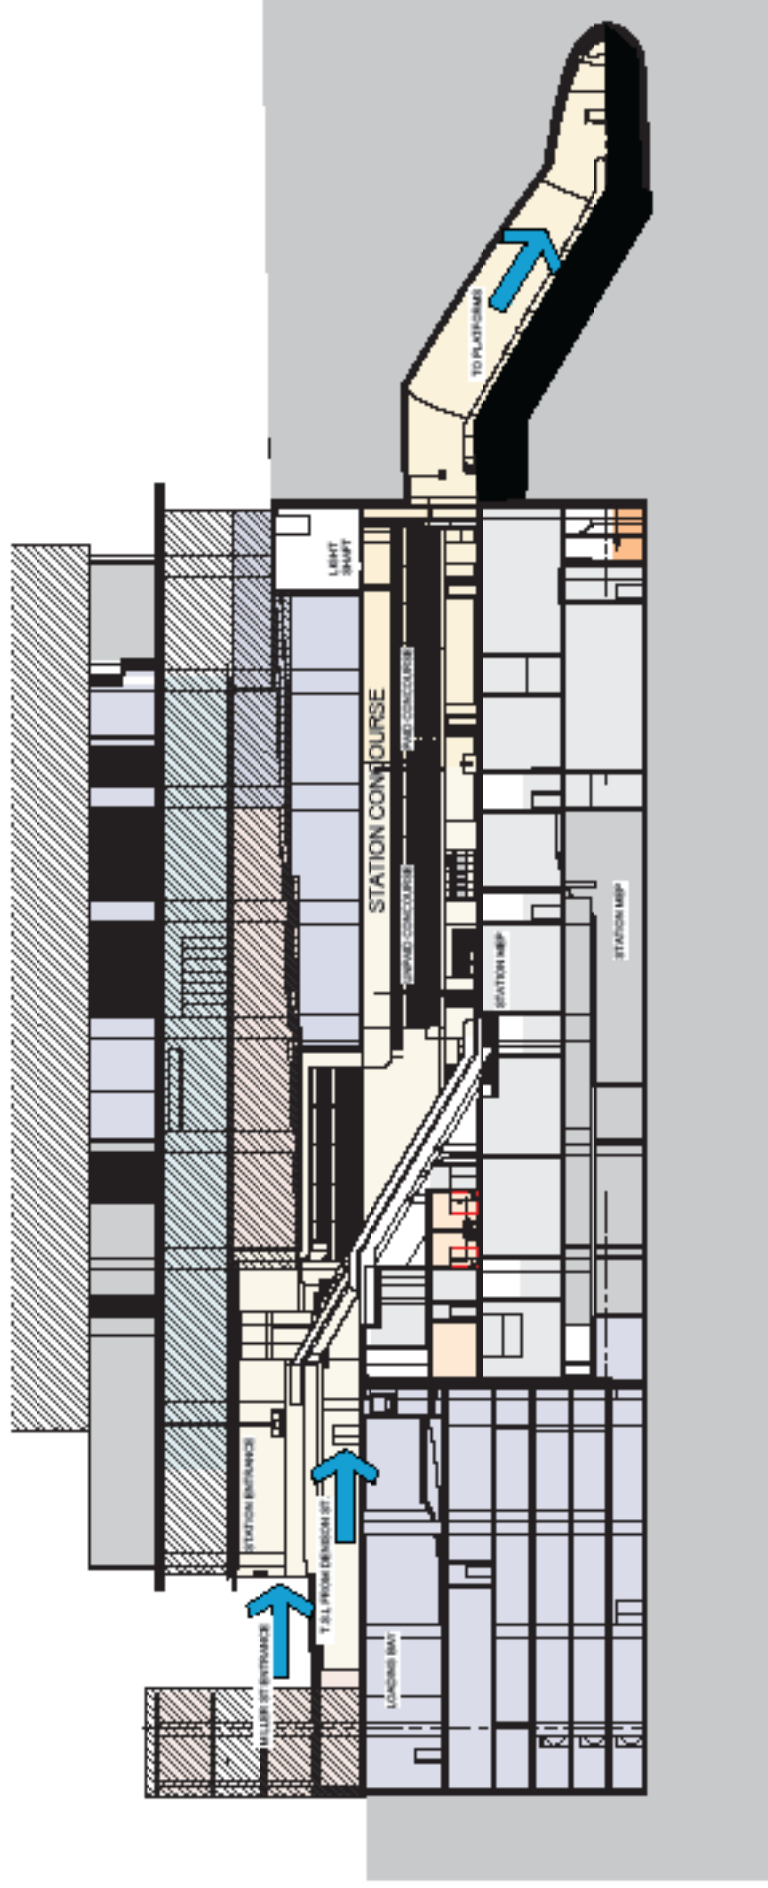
Southern Railway Station looking west, showing through the hall, concourse and platforms to concourse, left and right.
